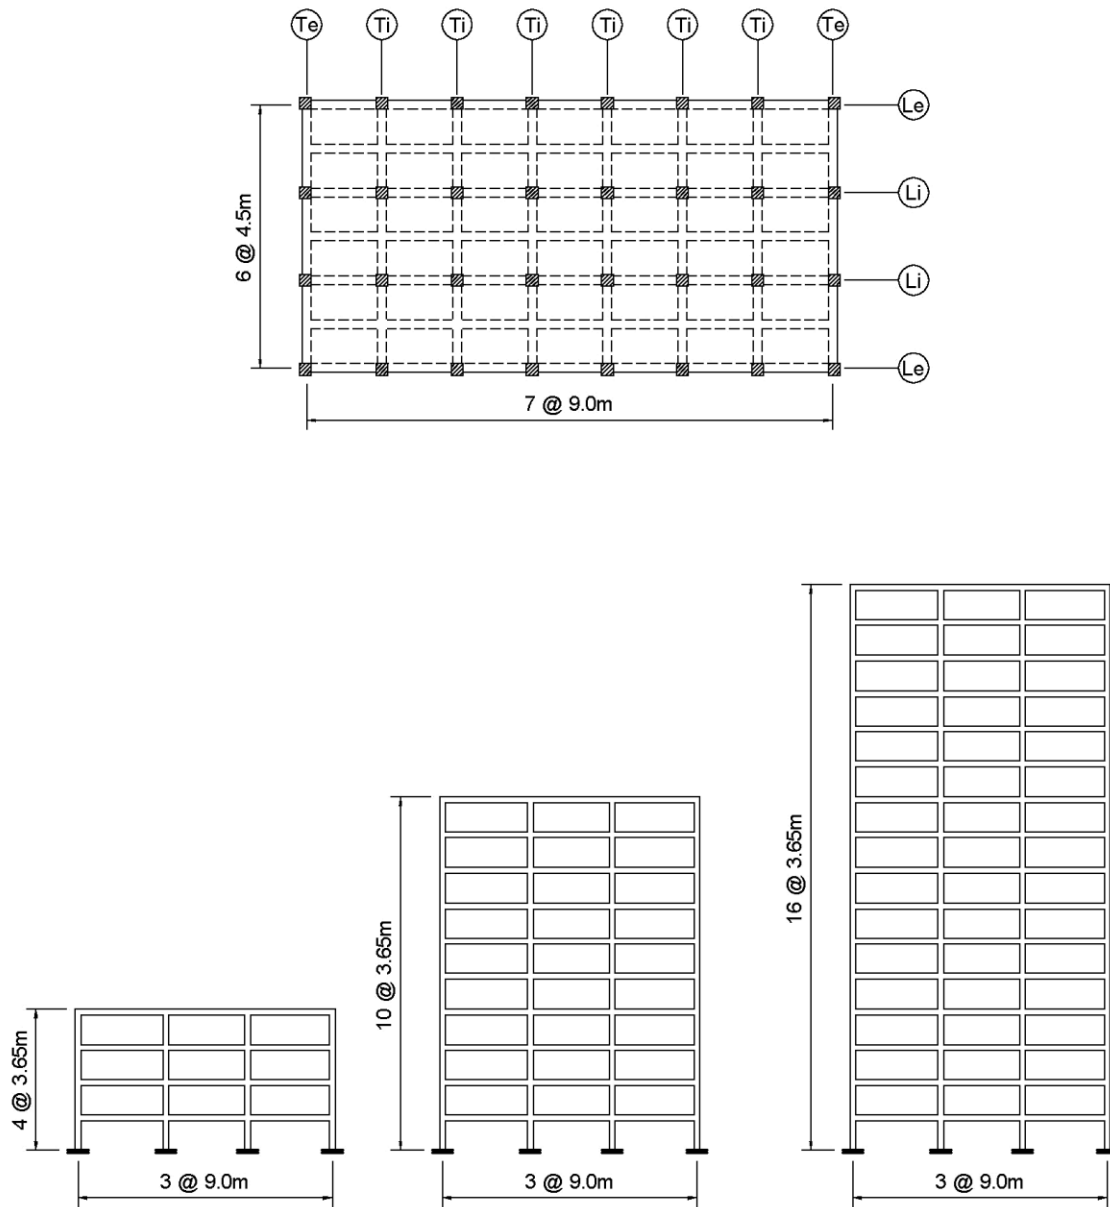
Plan of floors and elevations of transverse frames of the buildings.
